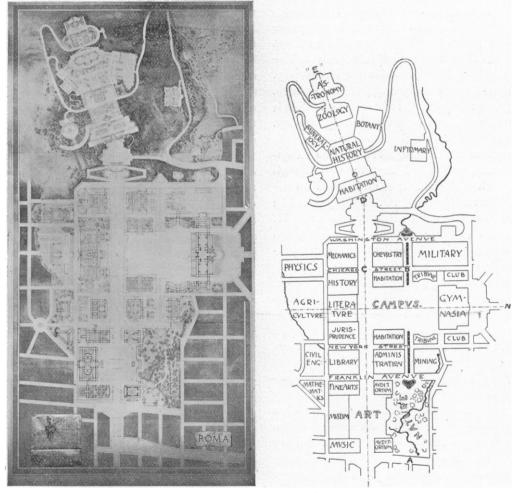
General plan and skeleton plan of buildings for the University of California.
